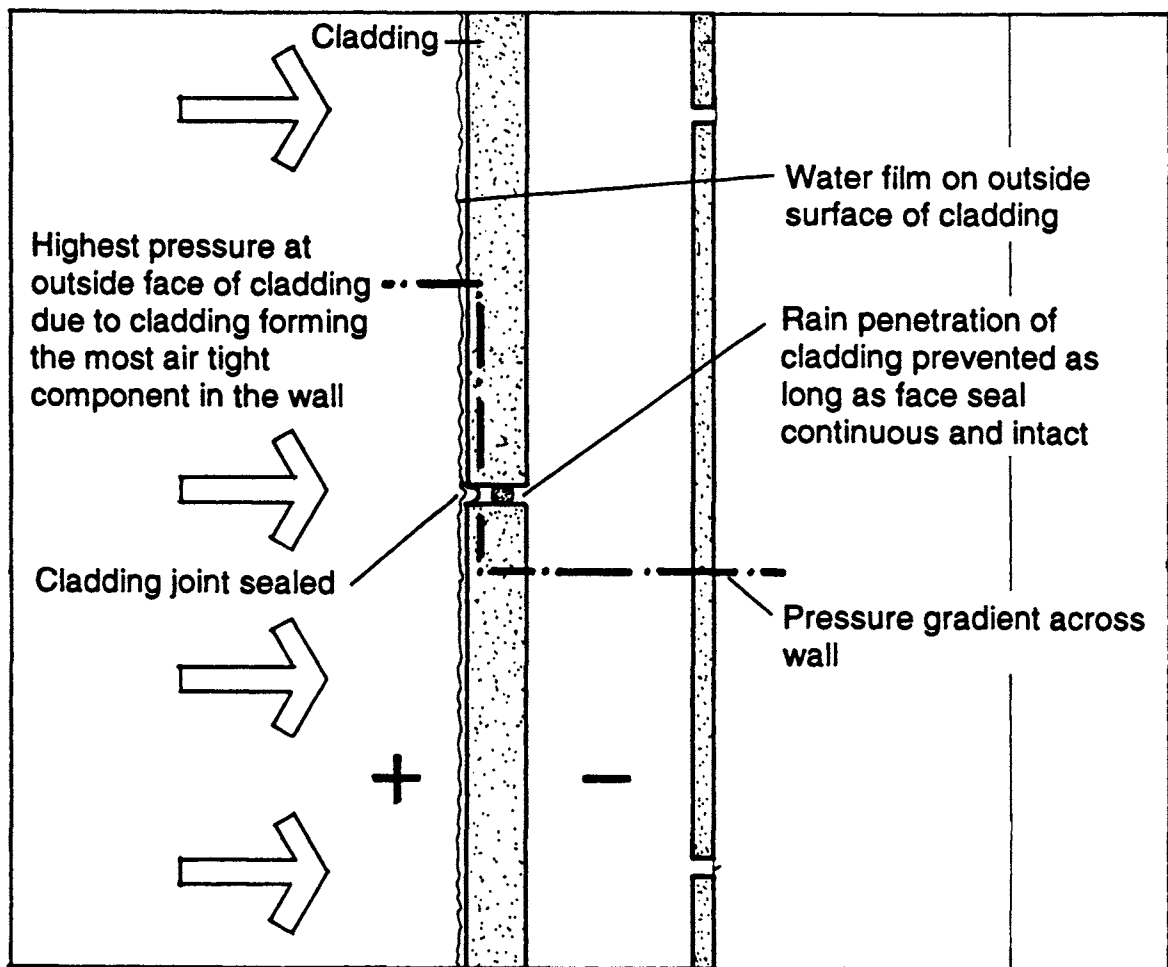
FACE SEALED SINGLE ELEMENT WALL
